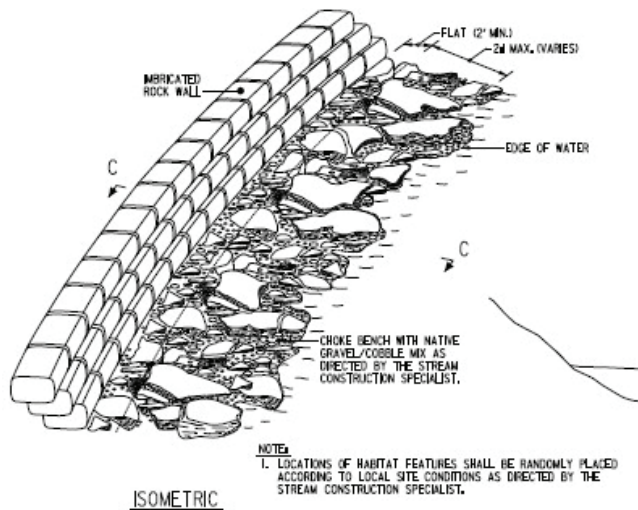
Implicated stone wall schematic drawing (Courtesy of Maryland DOT).
